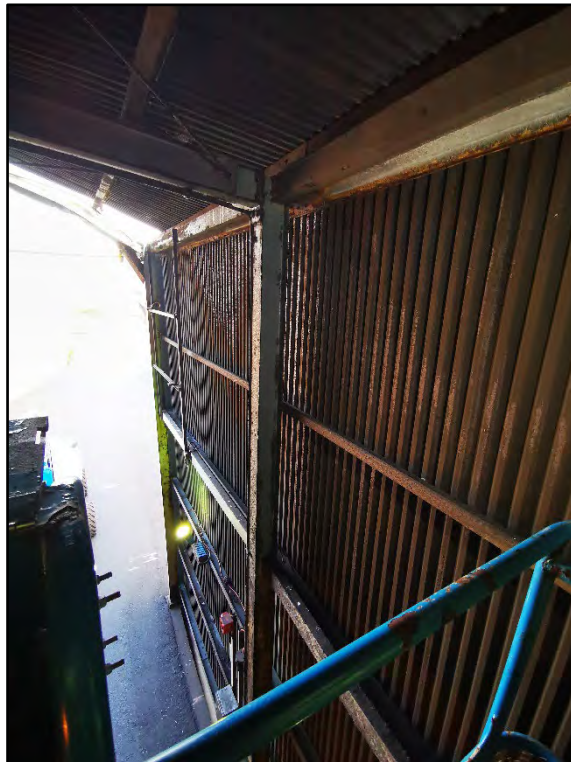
Impact Damage on Rafter in Unloading Bay
